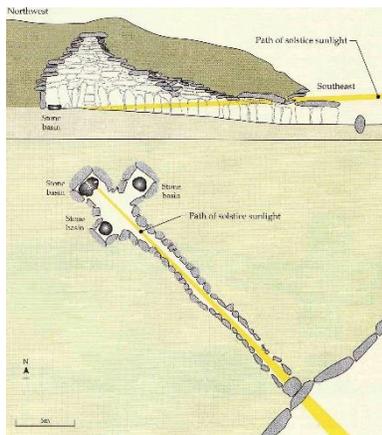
Cross-section and plan Newgrange (NEWGRANGE, n.d.)
